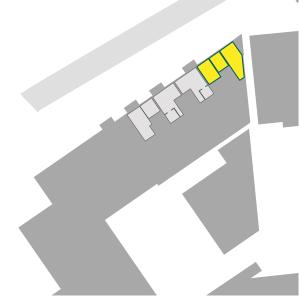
Flat 72 (GIA Ref - Flat 1) location key plan
